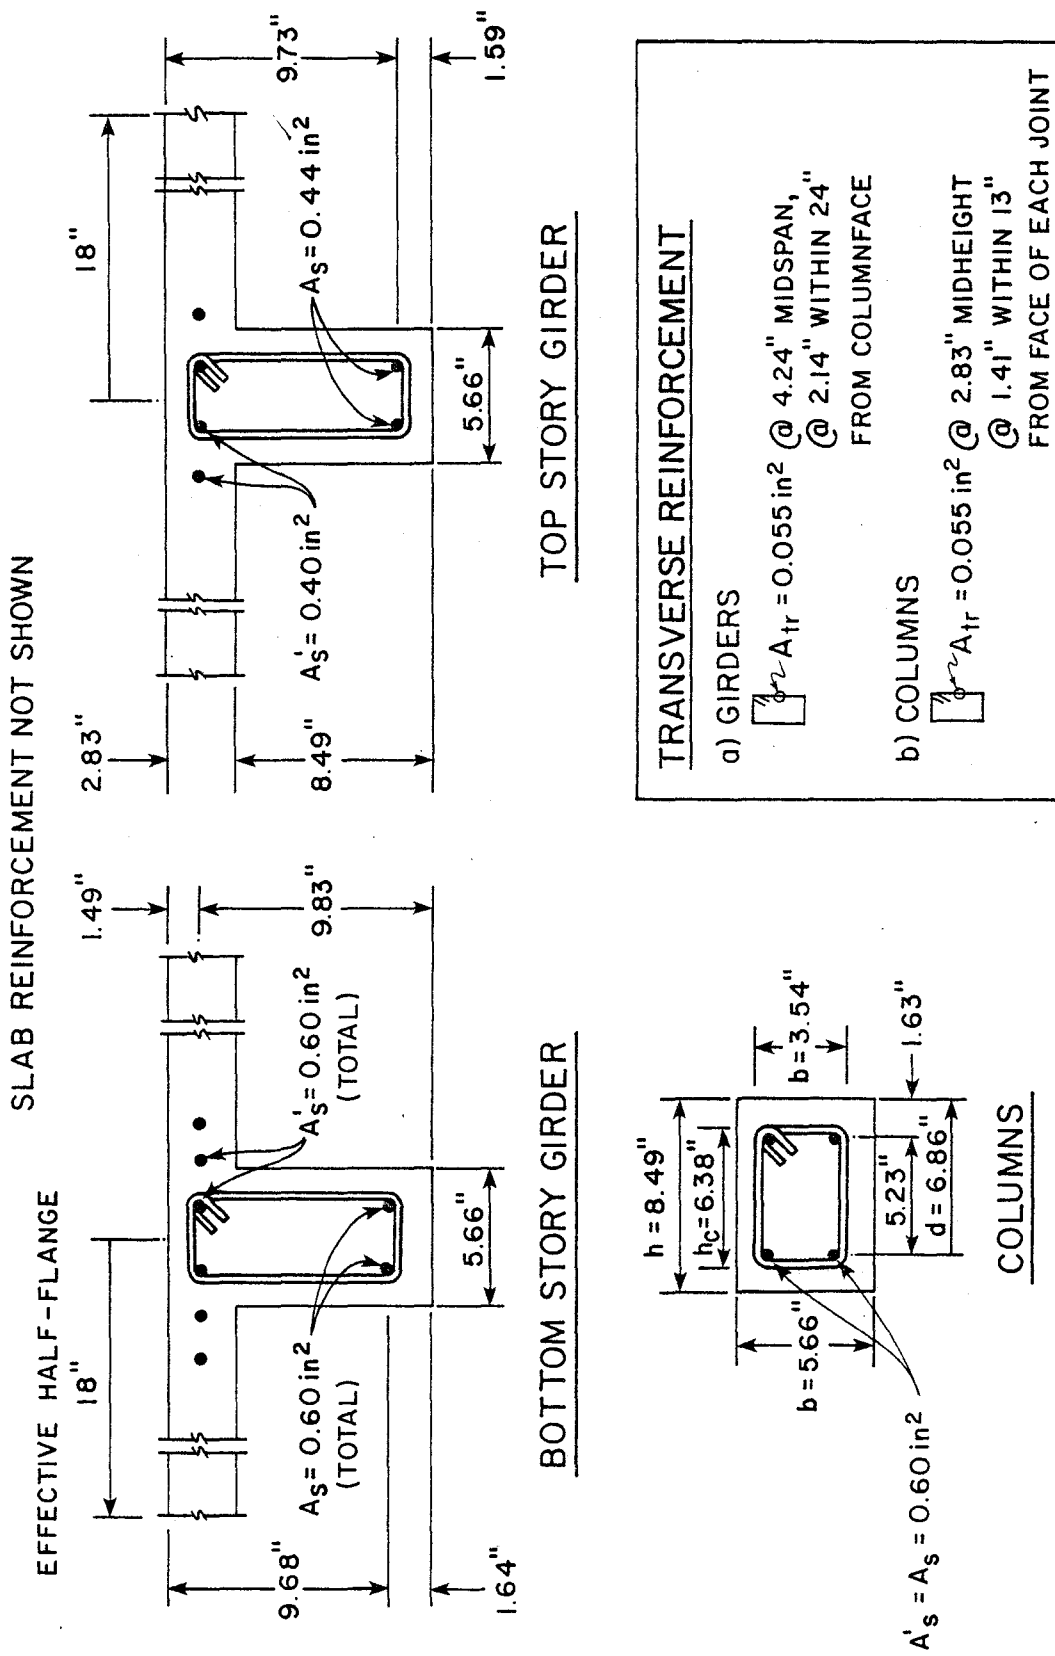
SECTION DIMENSIONS AND PROVIDED REINFORCEMENT. IDEAL MODEL
